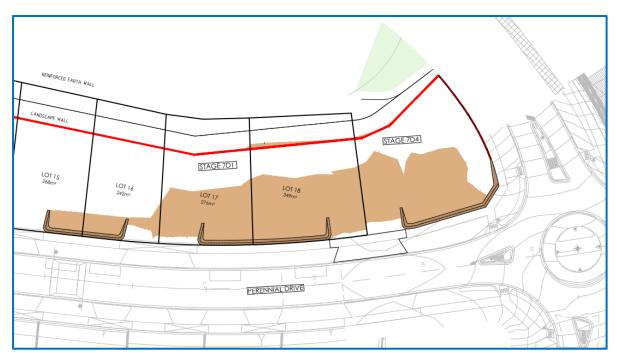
Extract from CJ Arms drawing titled 'Fill Layout Plan', Project No.15006, Drawing No.9901, Sheet 2 of 2, Rev 1
